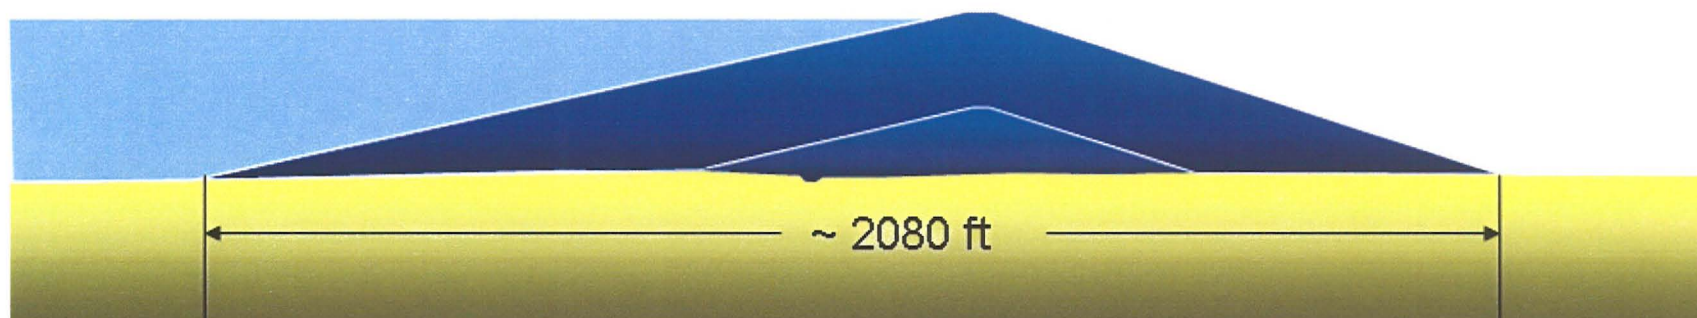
Dam Cross Section – Reservoir at Elev. 1702 ft.
